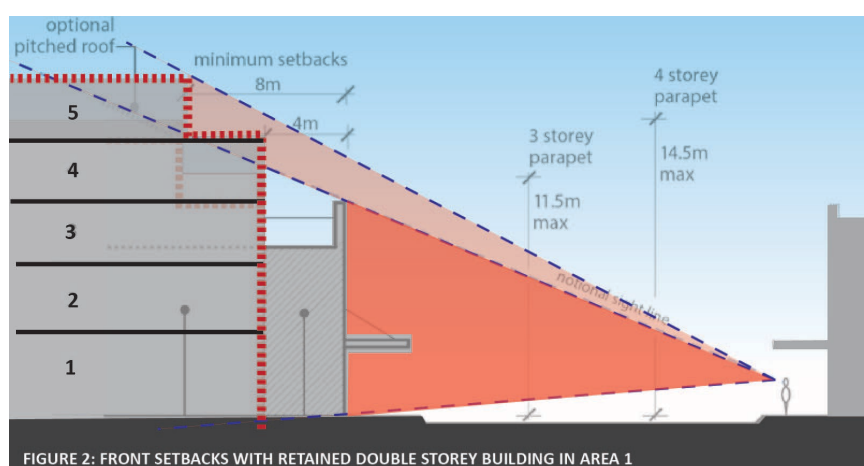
Proposed front setbacks with retained double storey building in Area 1
